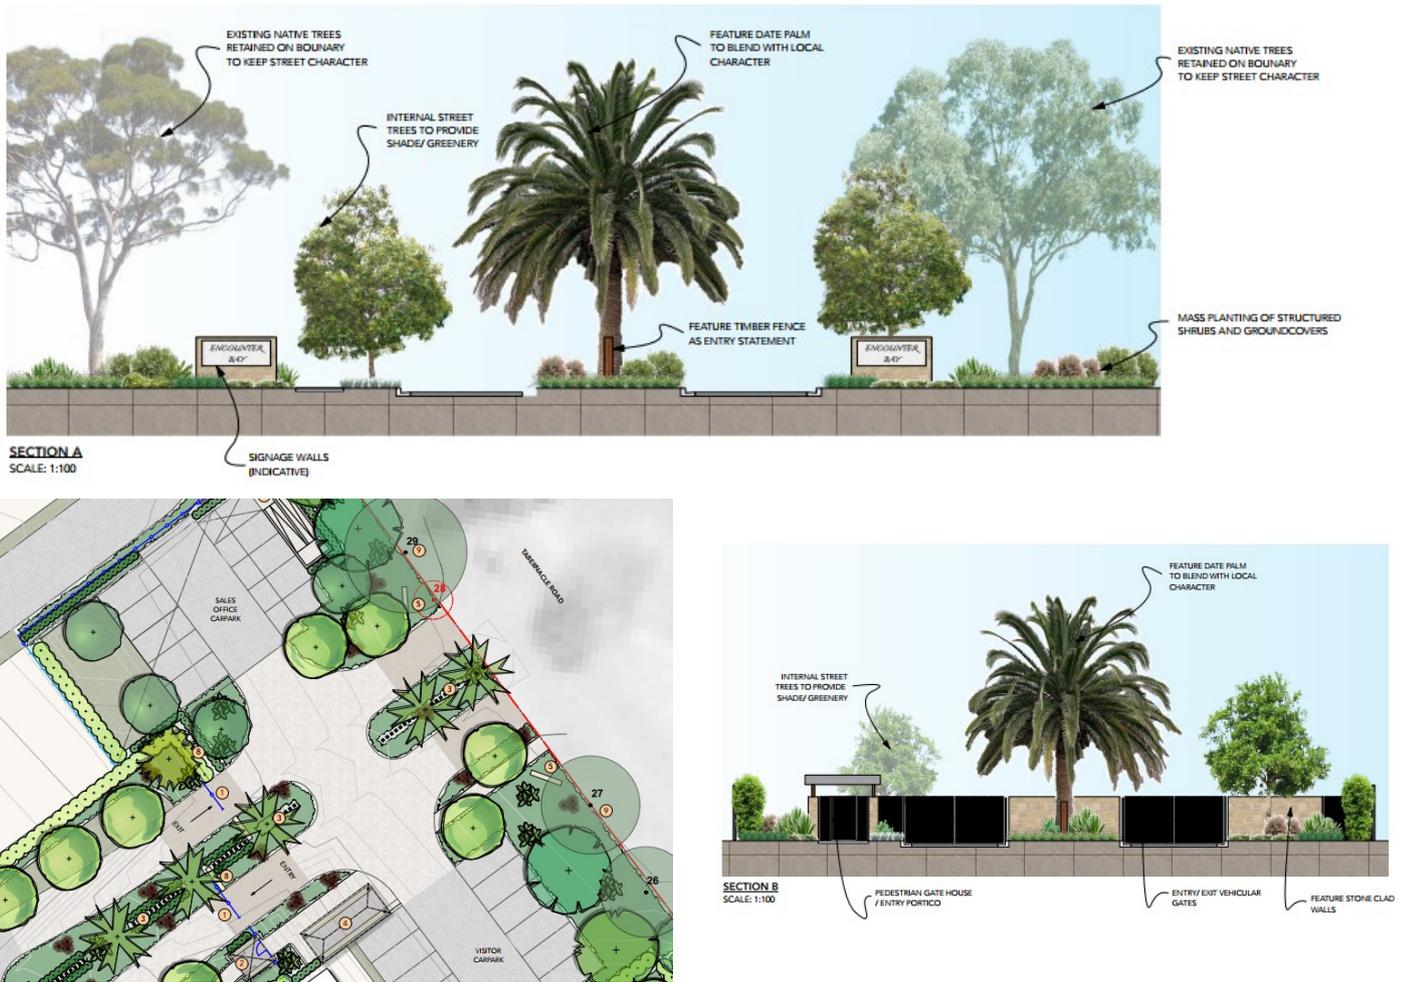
Tabernacle Road entry detail (Studio 151)
